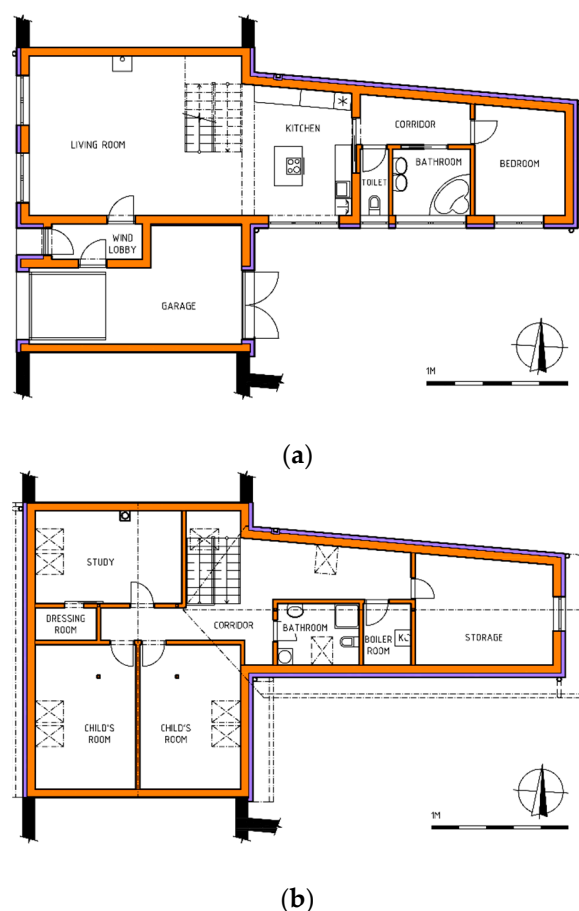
Newly constructed terraced house replacing the original as evaluated in V-3 LCA: (a) ground floor plan and (b) habitable attic plan with coloured hatching indicating different construction materials. Black = envelope walls of adjacent houses, grey = original structures, orange = hollow ceramic blocks, purple = additional EPS thermal insulation of the façade.
